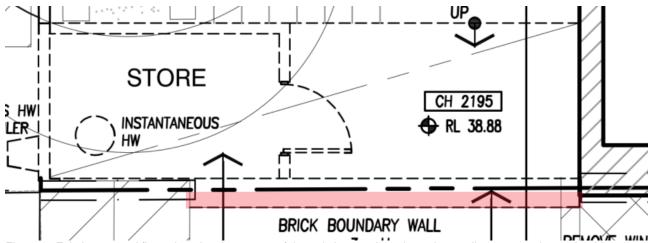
Existing ground floor plan showing extent of the existing southern boundary wall constructed over the title boundary (highlighted in red).
